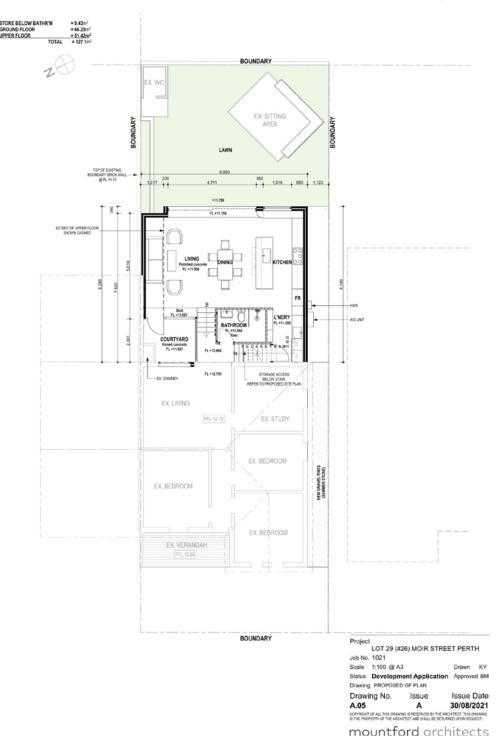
GROUND FLOOR PLAN OF PROPOSED TWO STOREY ADDITION Mountford Architects
